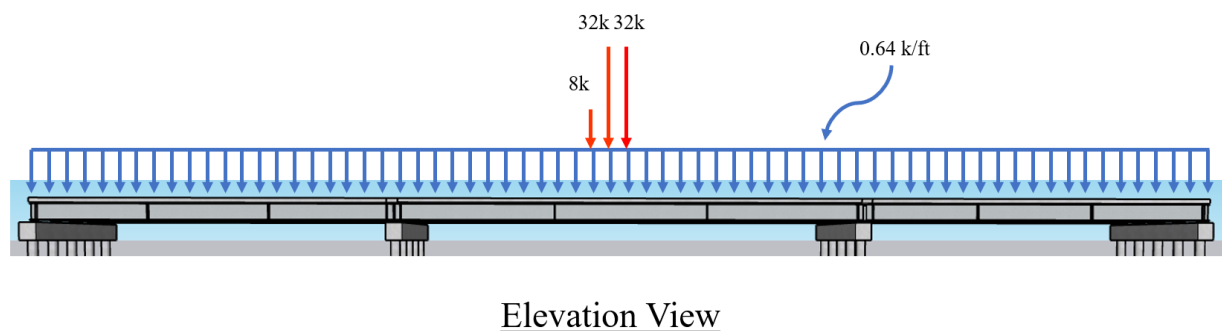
HL-93 Loading—Truck and Lane Load.
